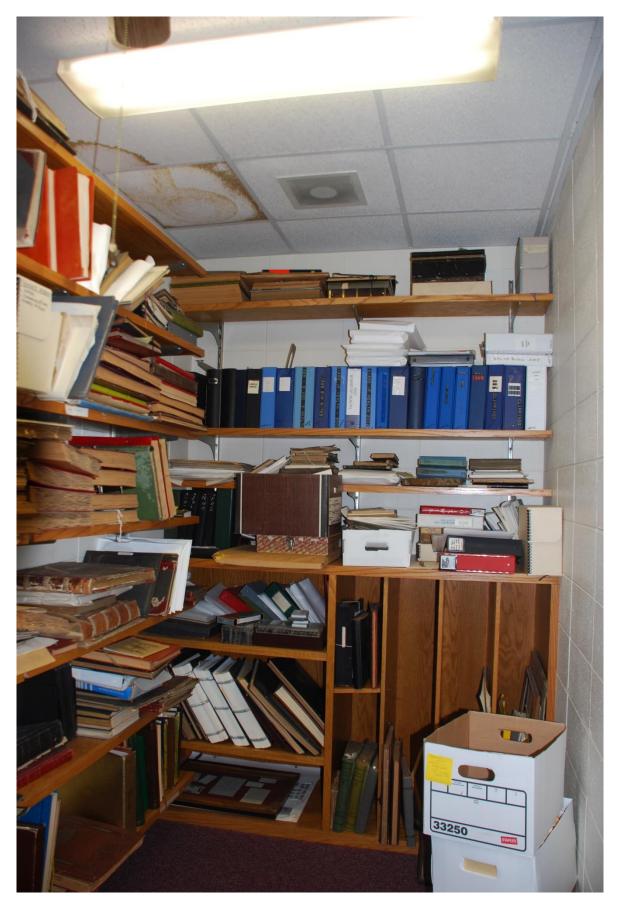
Archives room. Note staining on ceiling from previous roof leak.
